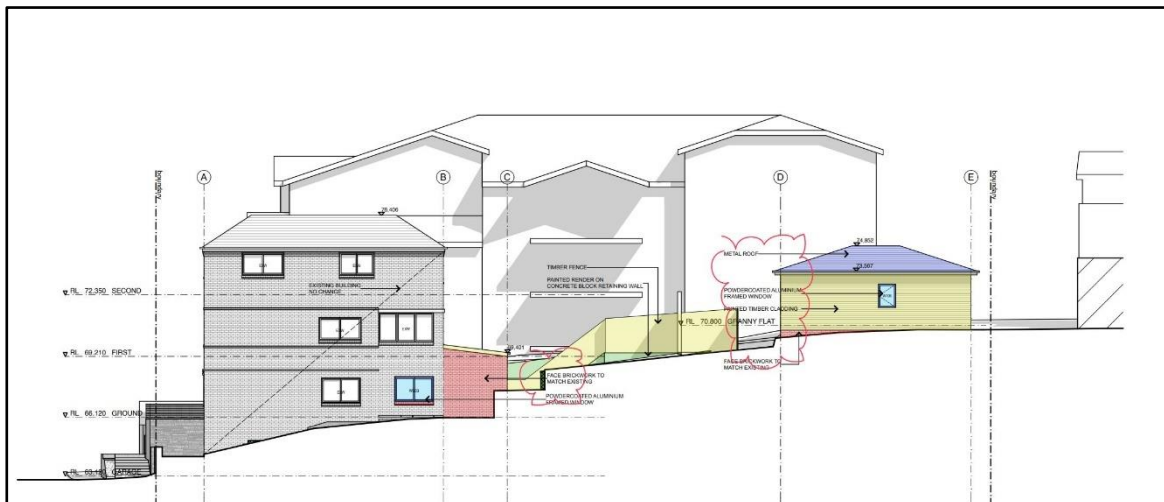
East Elevation (Rev B), 2/11/2023 (Fortey & Grant Architecture)
